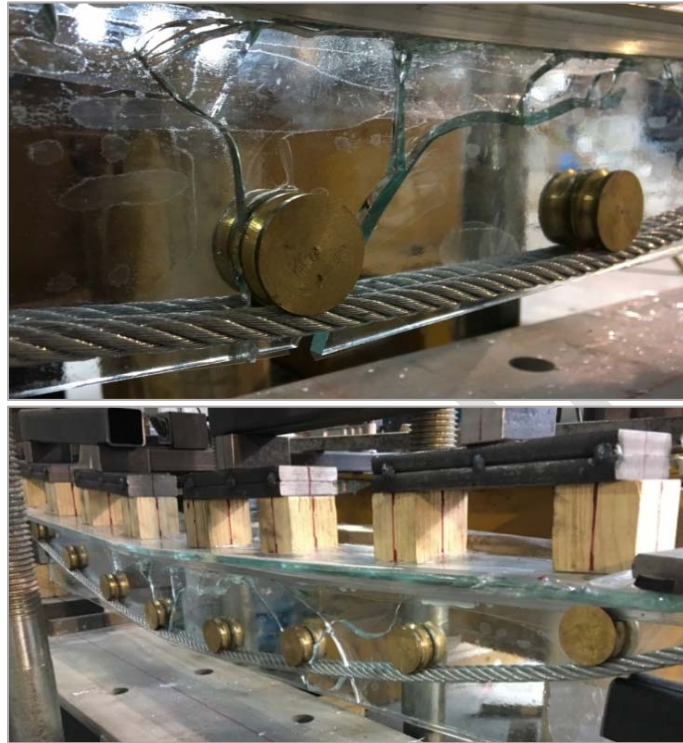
Float glass T-beam with post-tensioning after the fracture.
